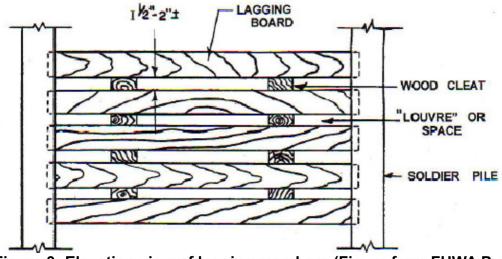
Elevation view of lagging members (Figure from FHWA Publication)
